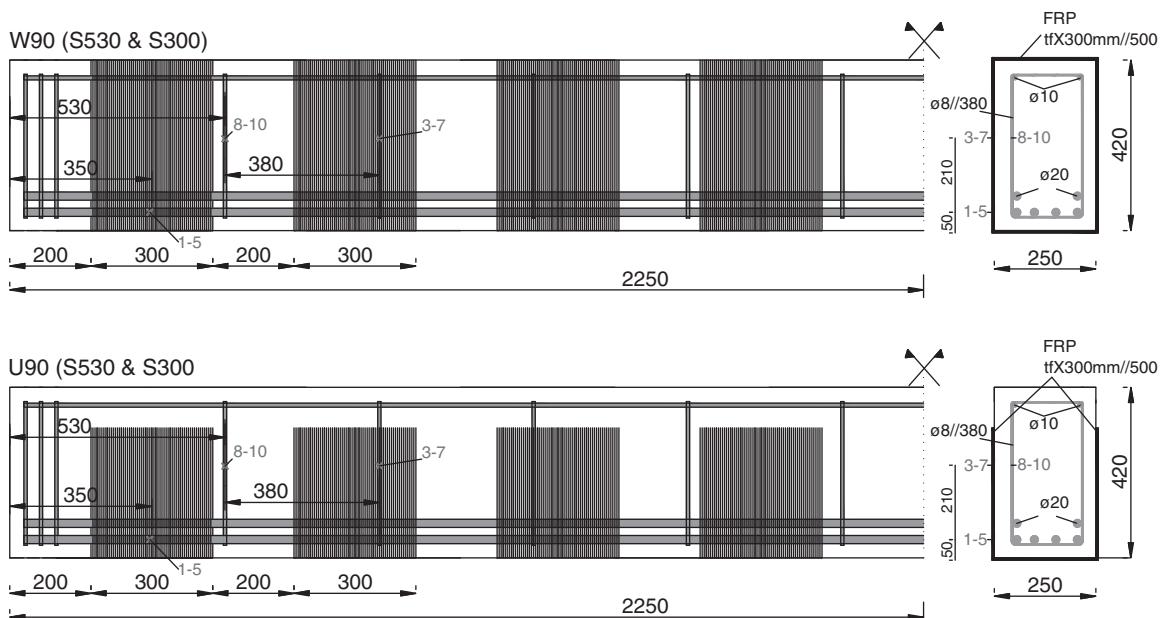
Geometry, reinforcement, strengthening configurations, and instrumentation of the beams tested by Alzate [7].
